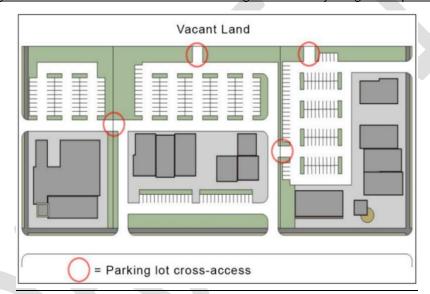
A. Cross-Access Between Parking Areas and Adjoining Developments.
